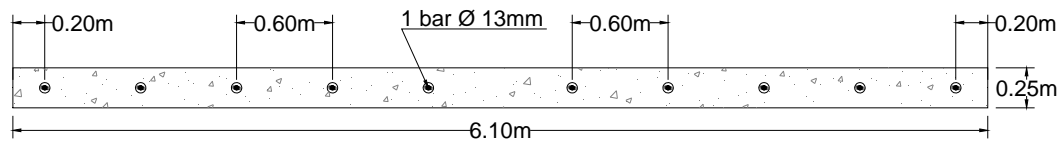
Distribution of flexural steel reinforcement in an AAC wall
